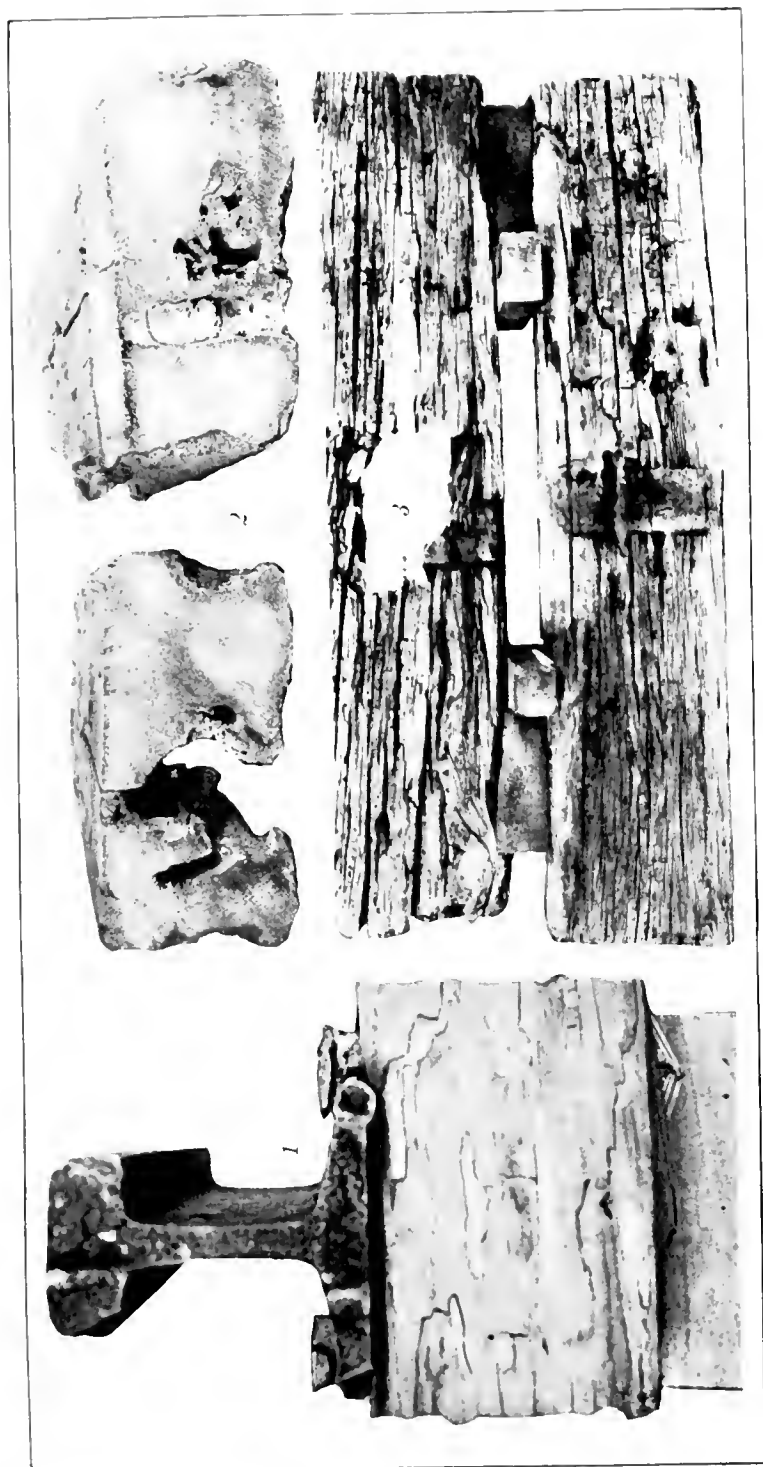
PLATE VIII. RAILWAY SLEEPERS DAMAGED BY TERMITES.
